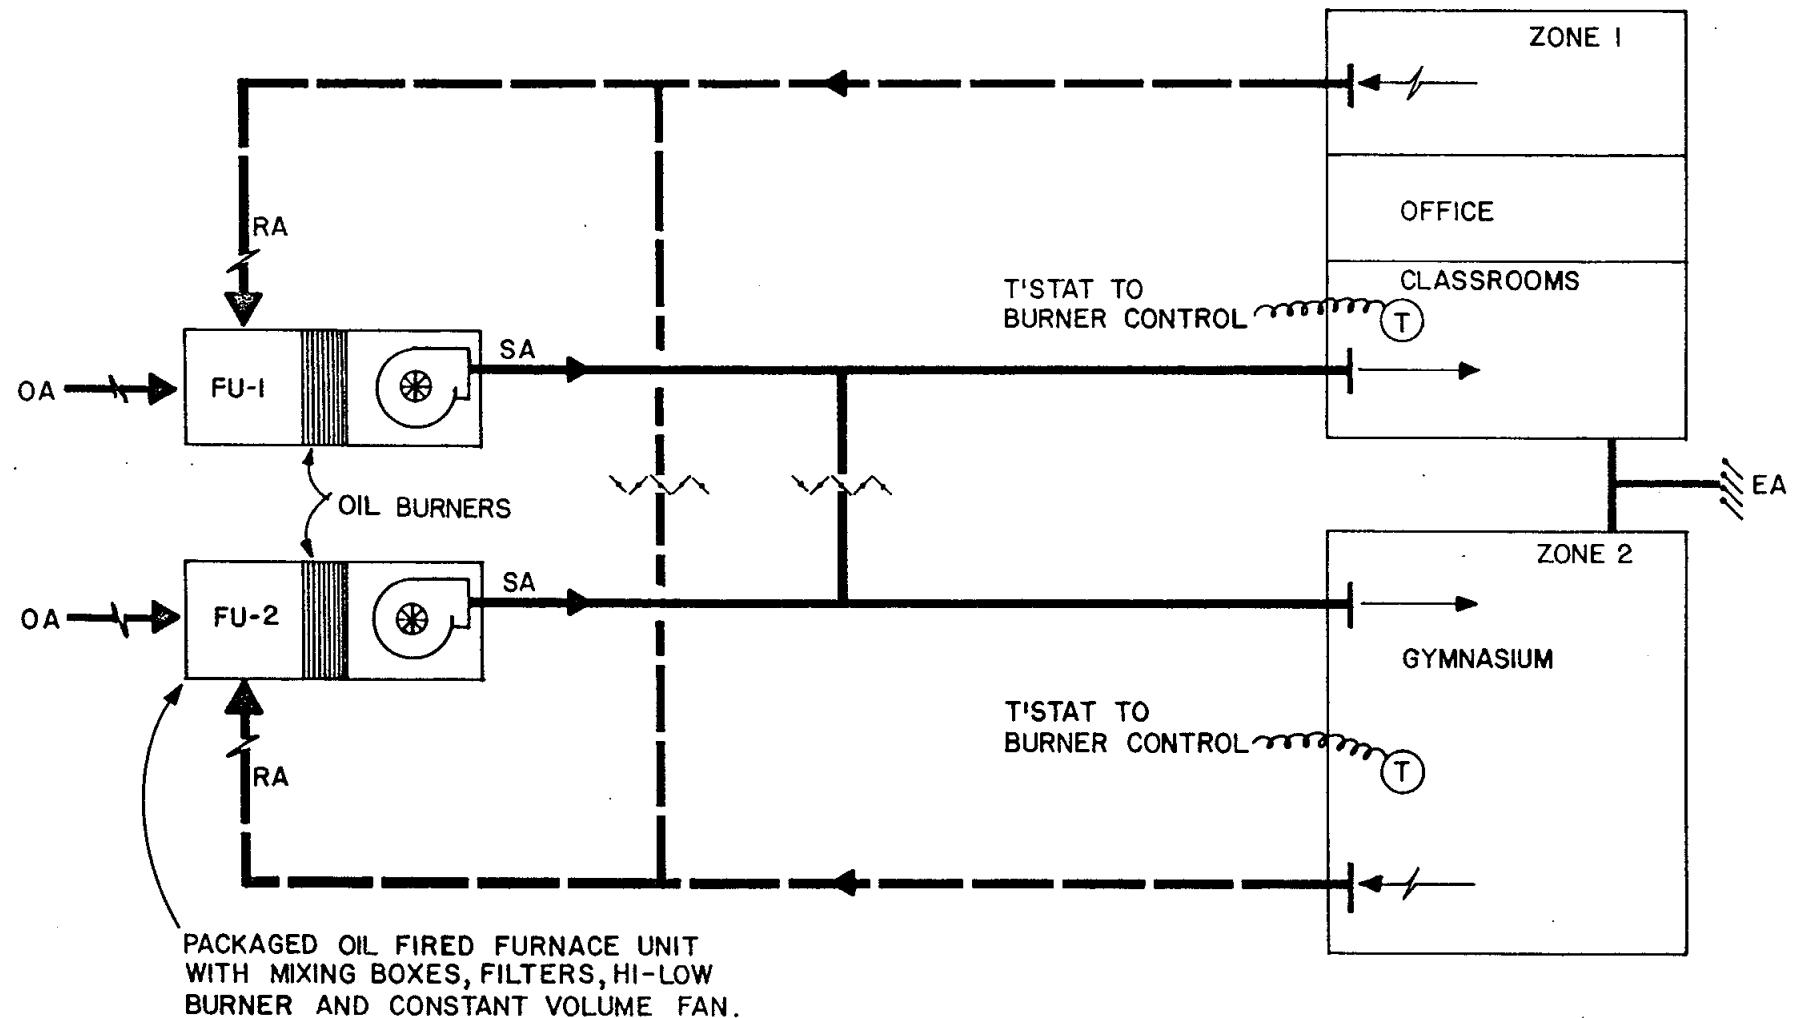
SCHEMATIC PLAN - PACKAGED HEATING FURNACE PLAN
